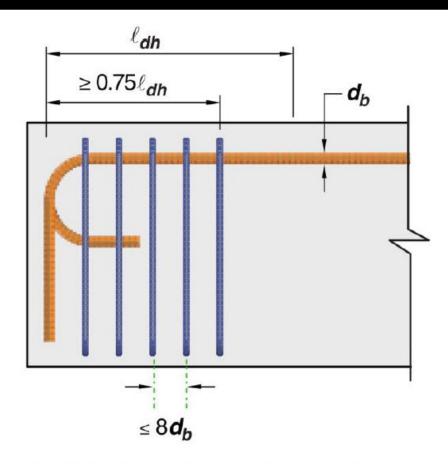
Confining reinforcement placed perpendicular to the bar being developed, spaced along the development length \(\ell_{\text{dh}}\), that contributes to anchorage strength of both 90- and 180-degree hooked bars.
